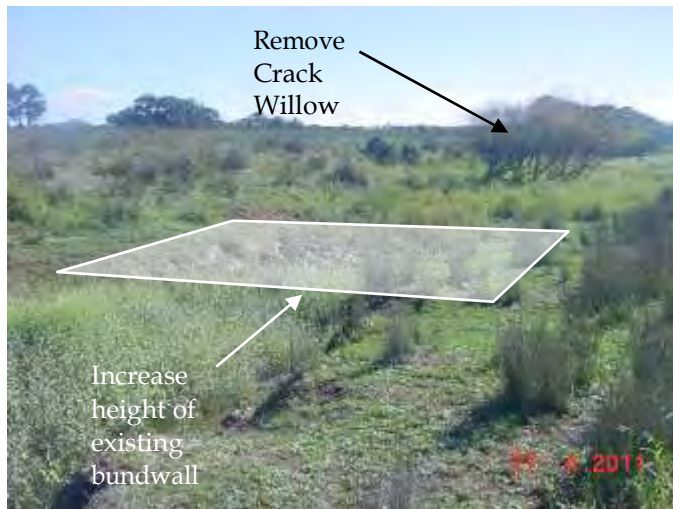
Site 13 - Cut-off Channel Showing Possible Location of Bundwall
